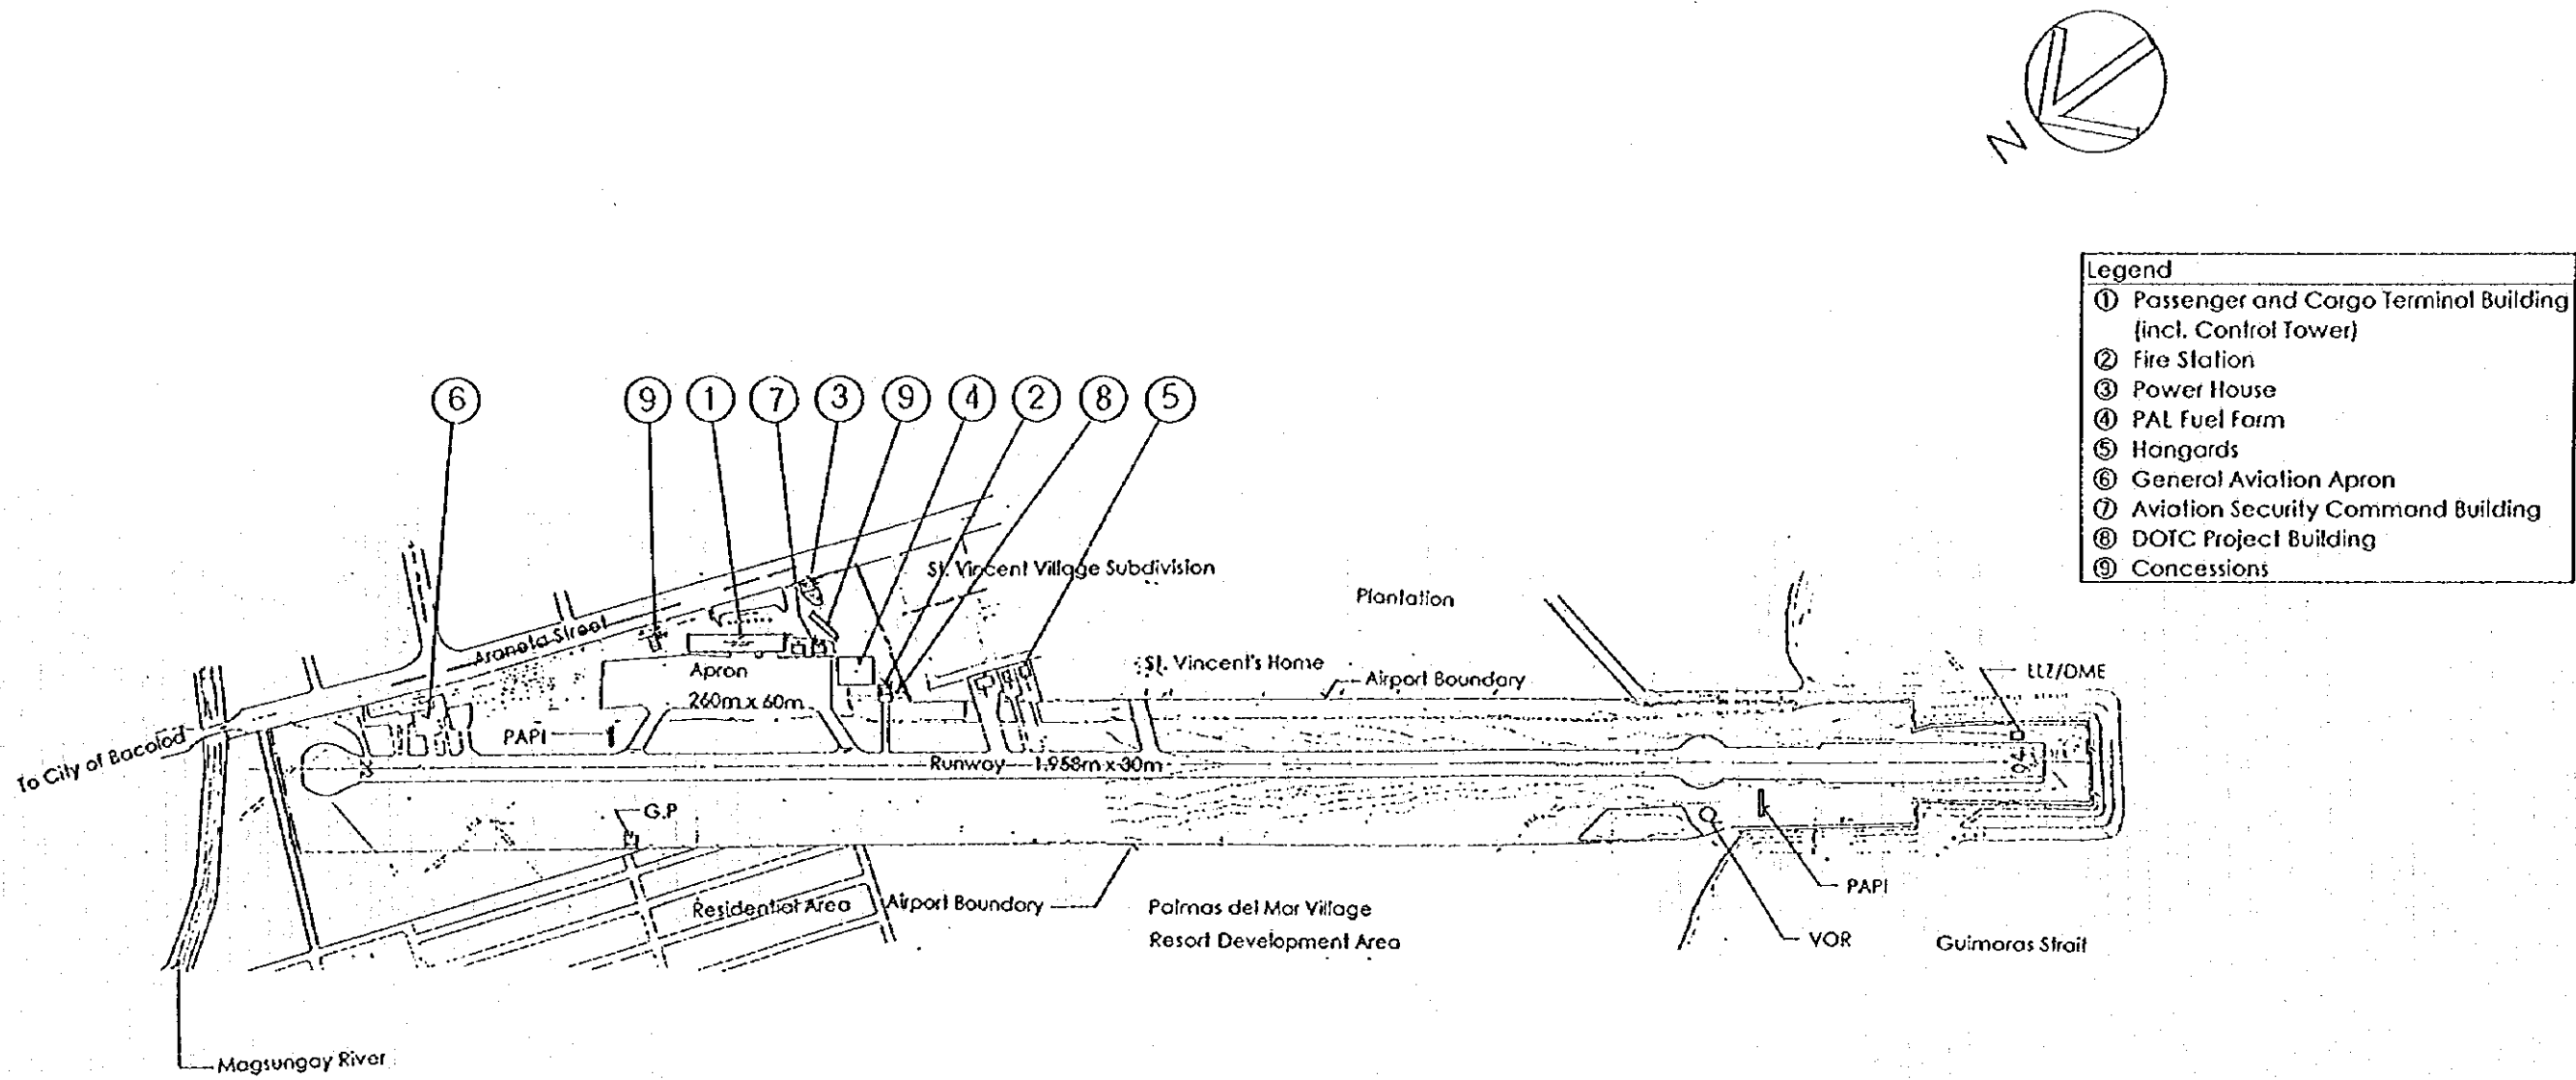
Existing Layout of Facilities at Bacolod Airport
